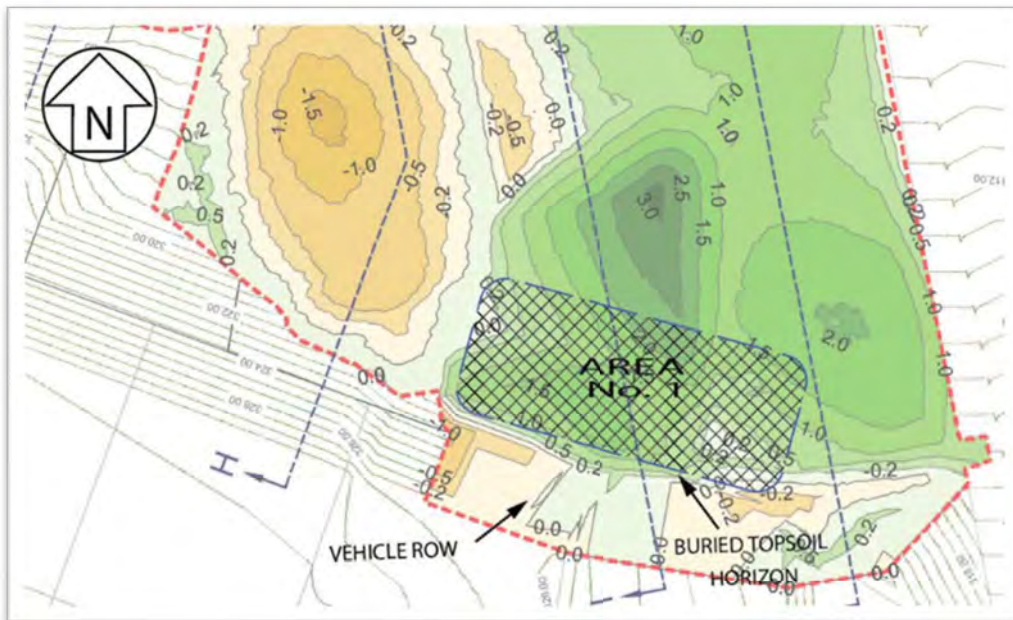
General location of engineered fill under construction relative to proposed earthworks plan
